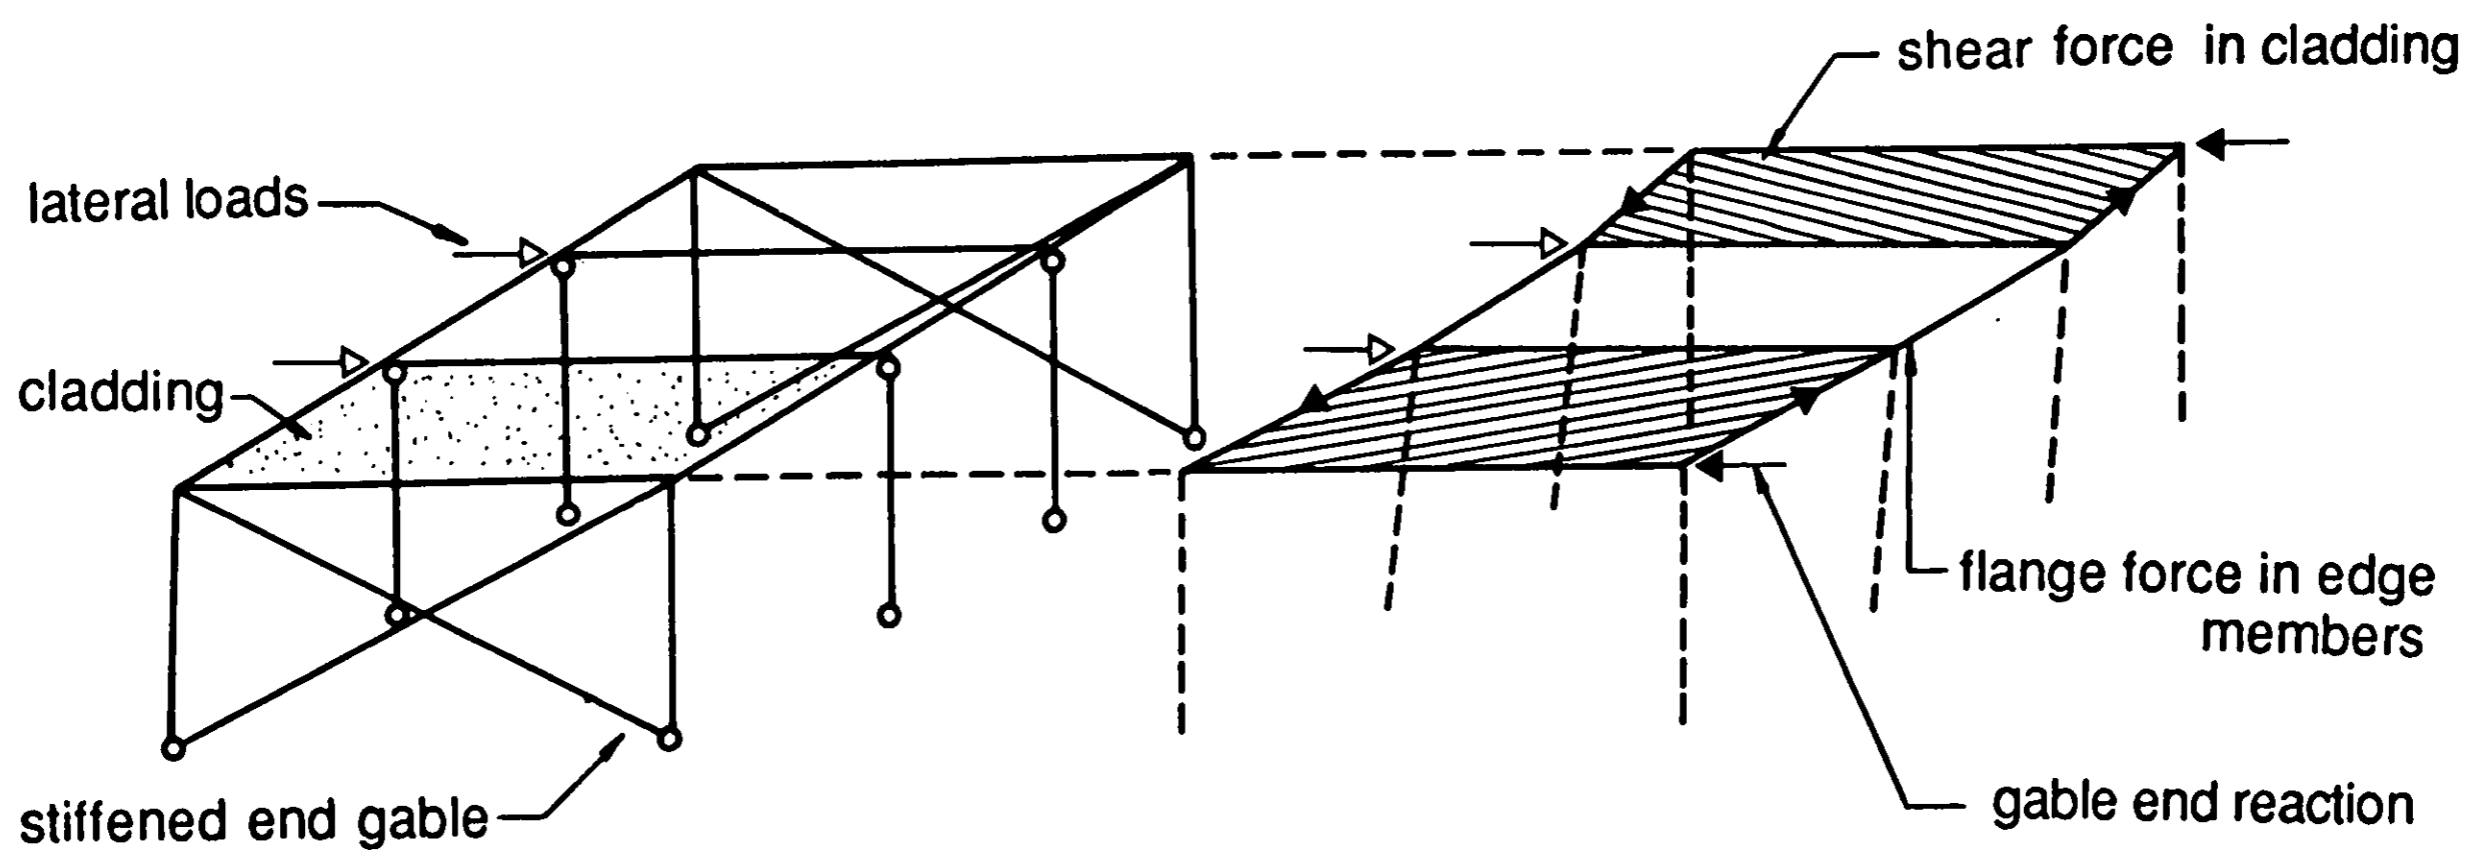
Diaphragm action in a flat-roofed building with non-rigid frames.
